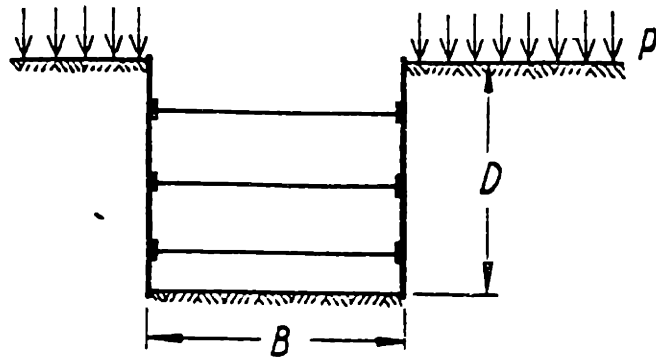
Standard basal heave calculations for braced excavations without wall embedment
